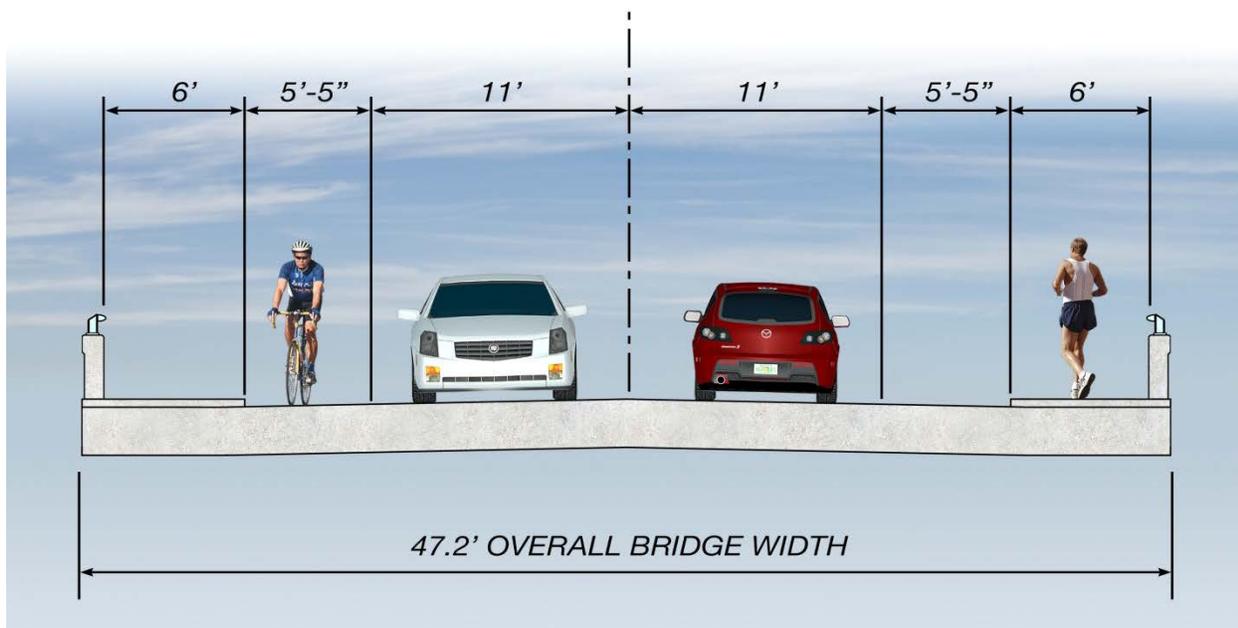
Proposed Bridge Typical Section – Recommended Alternative
